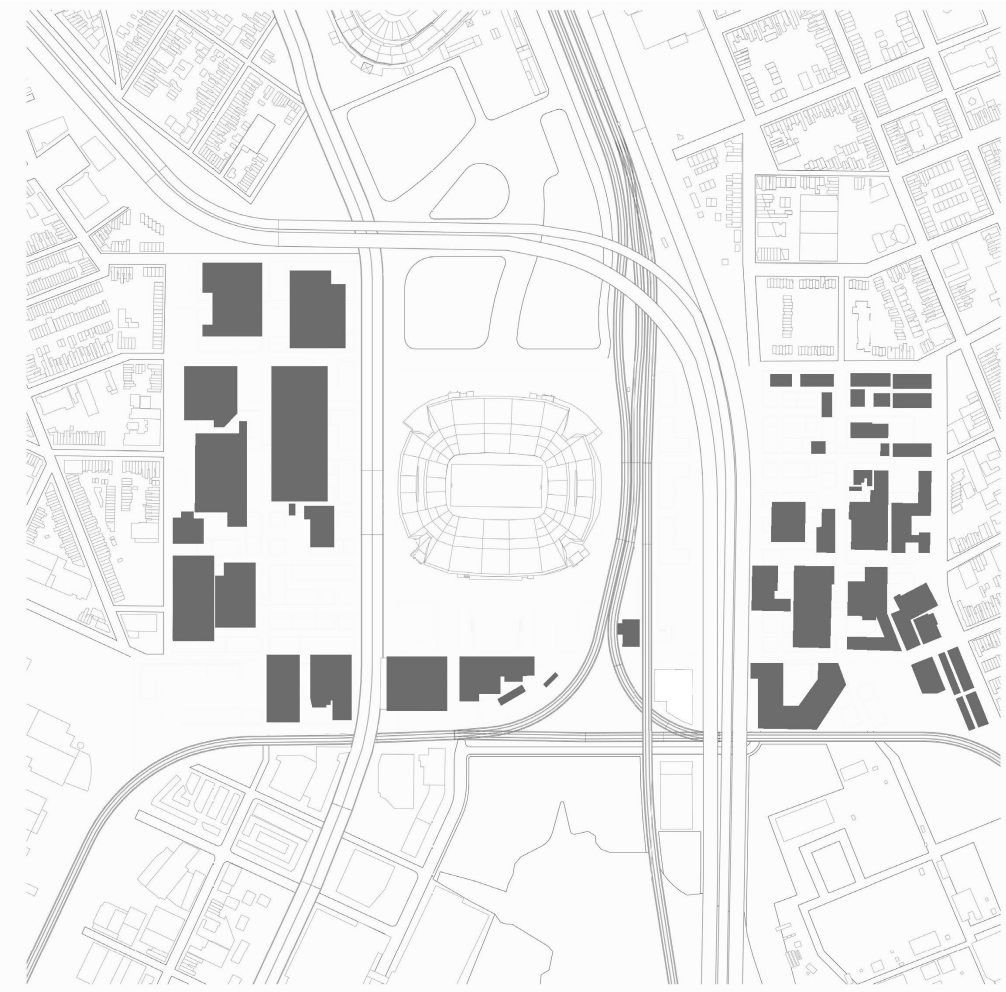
, Master Plan - Site Plan - Demolition (Source: Drawn by Author)
